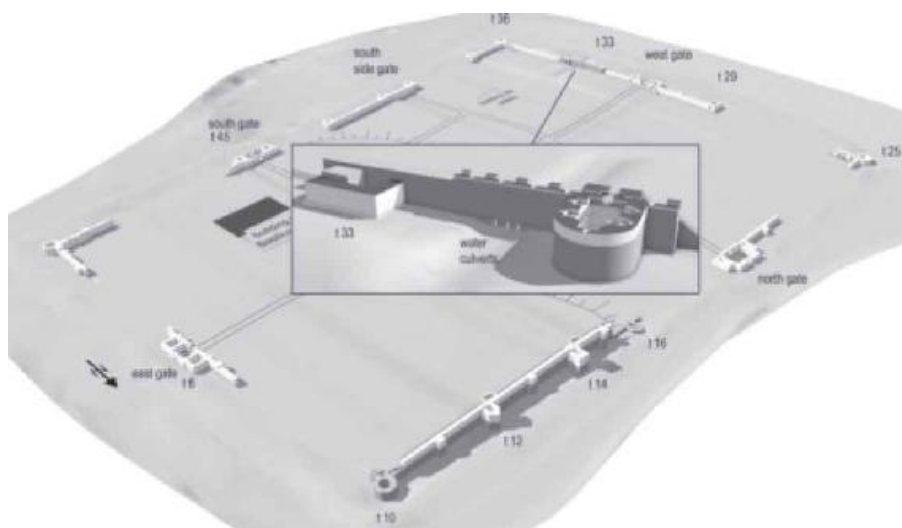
Resafa, city wall, reconstruction of building stage 2. Changes at the water culverts after the fall of Amida 503 AD. The building site expands. New wall partitions rise according to the model section with sophisticated tower shapes (round, U-shaped and polygonal) (N. Erbe & C. Hof).
